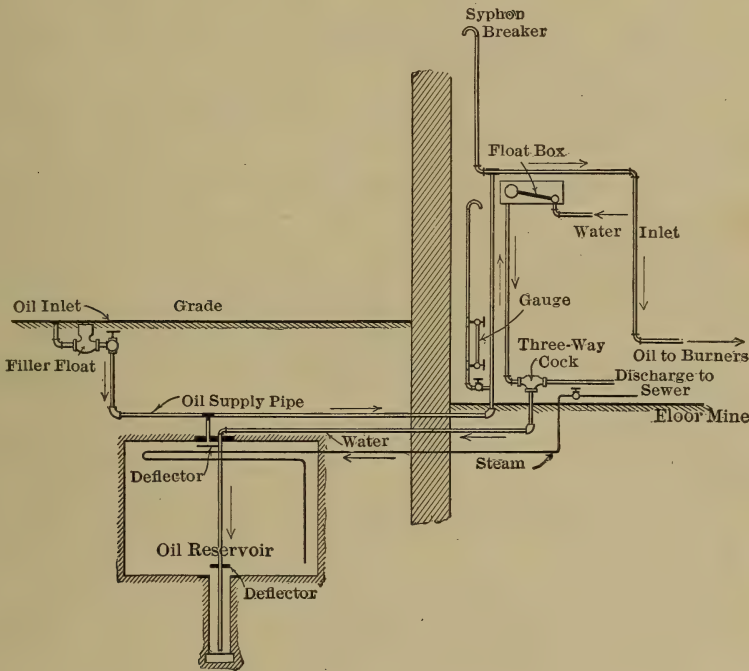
Hydraulic Oil Storage Company's Fuel Oil System.
